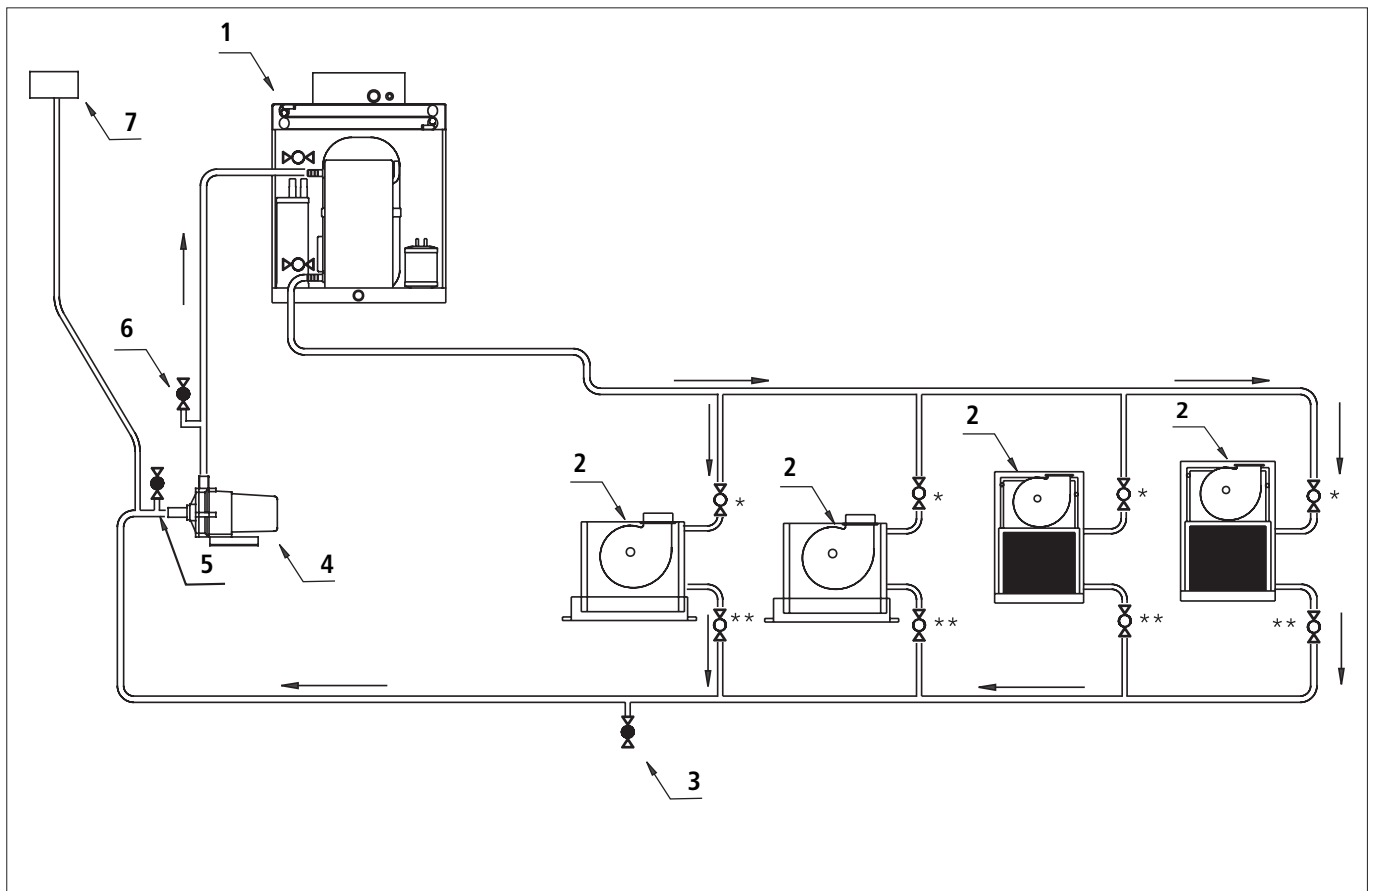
Example of cold water circuit - open system: 1 chiller unit and 4 air handlers
